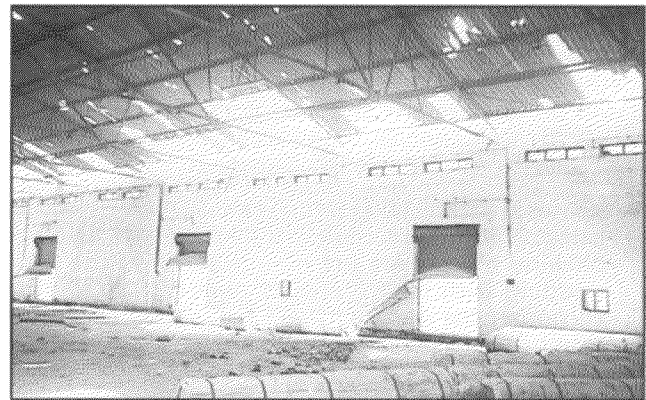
Failure to Rolling Shutters and A.C. Sheet Roofing
